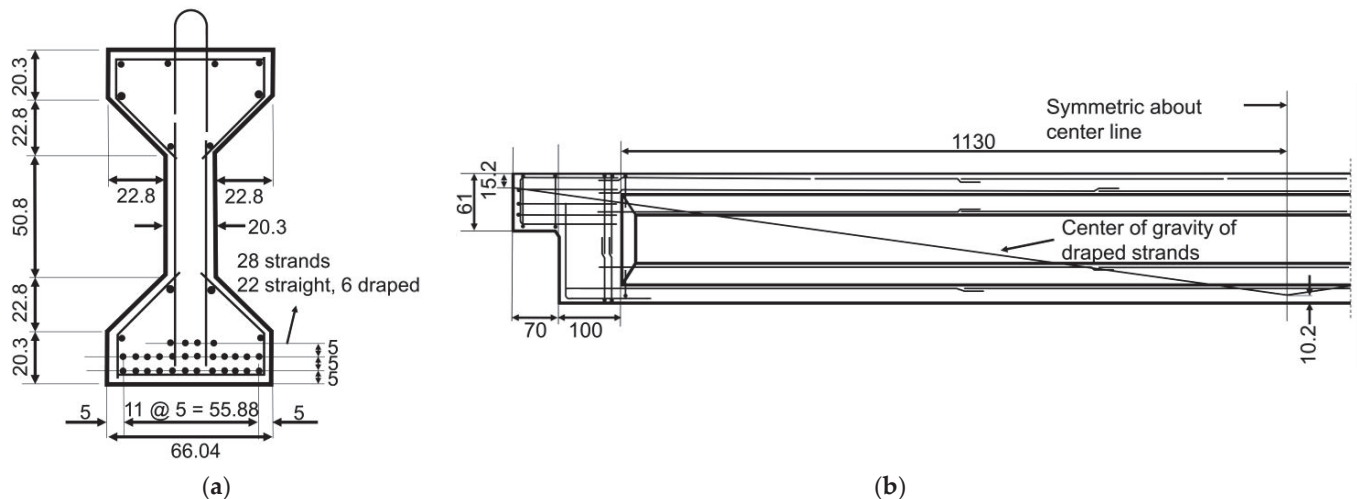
The testbed structure: (a) cross-section view of each girder and (b) elevation view of each girder. All the dimensions are in centimeters, and all reinforcing rebars are #4 (equivalent to $\Phi 13$).
